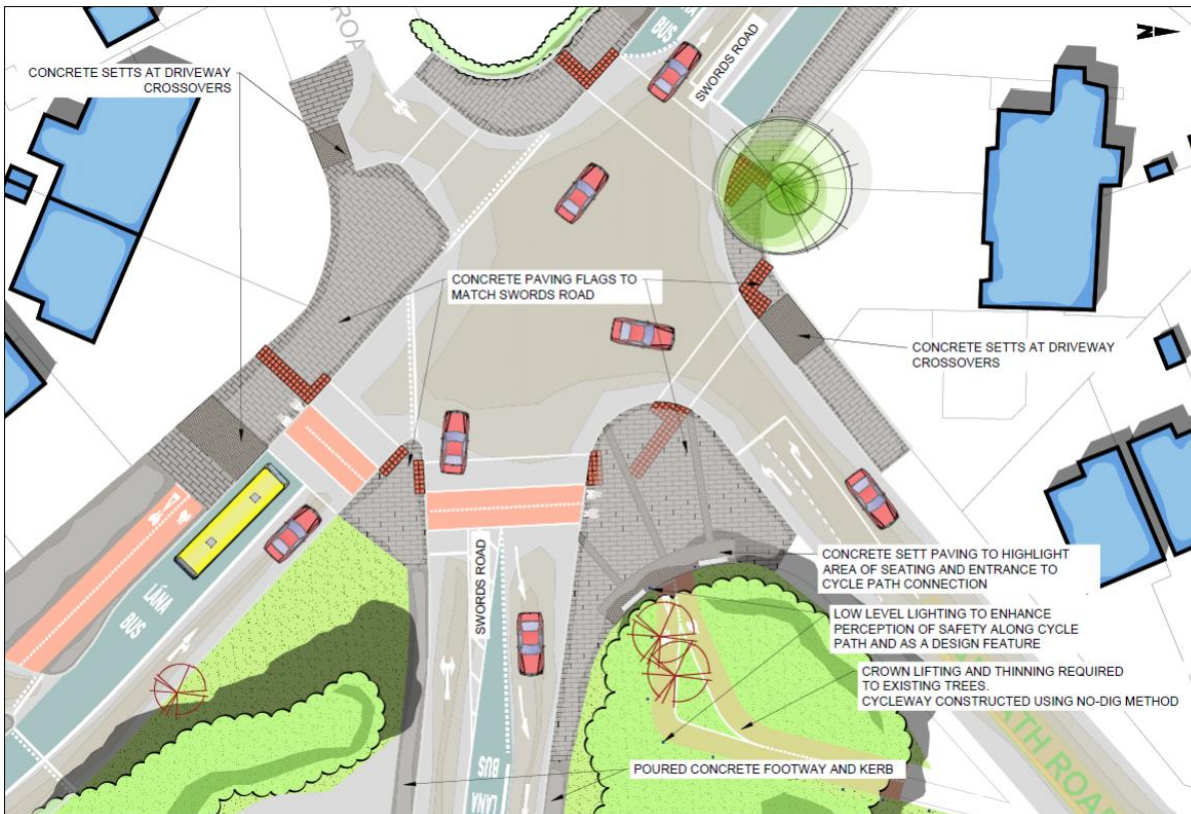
Eastern Corner of the Shanrath Road-Larkhill Road Junction Indicative Design
